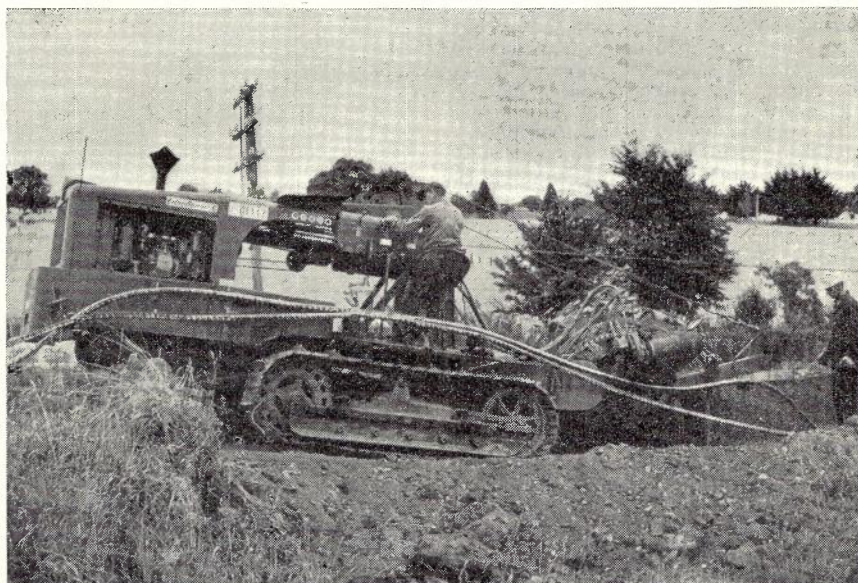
B.G.774 Ditcher with rollers fitted along the side, laying two cables.
